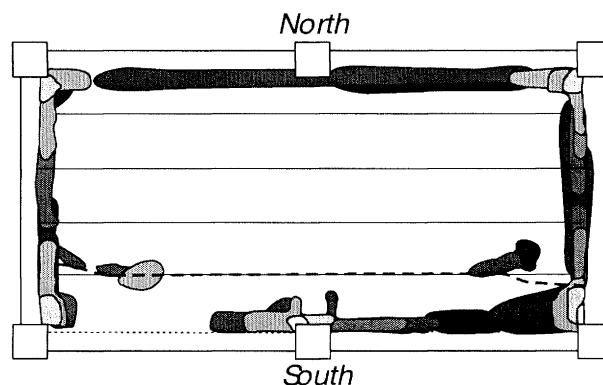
Plan showing delamination zones in the concrete topping (Matthews *et al.*, 2003a).
